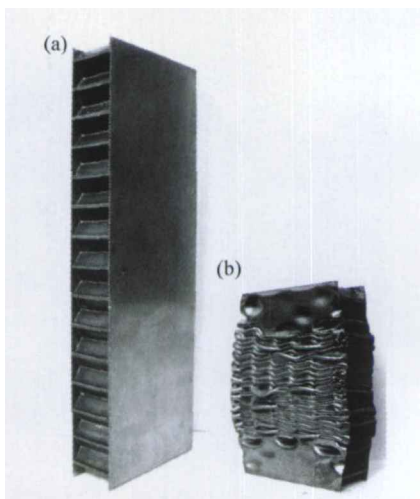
Shapes of the specimen T4 before and after testing: (a) undeformed shape before testing; (b) deformed shape after testing.
